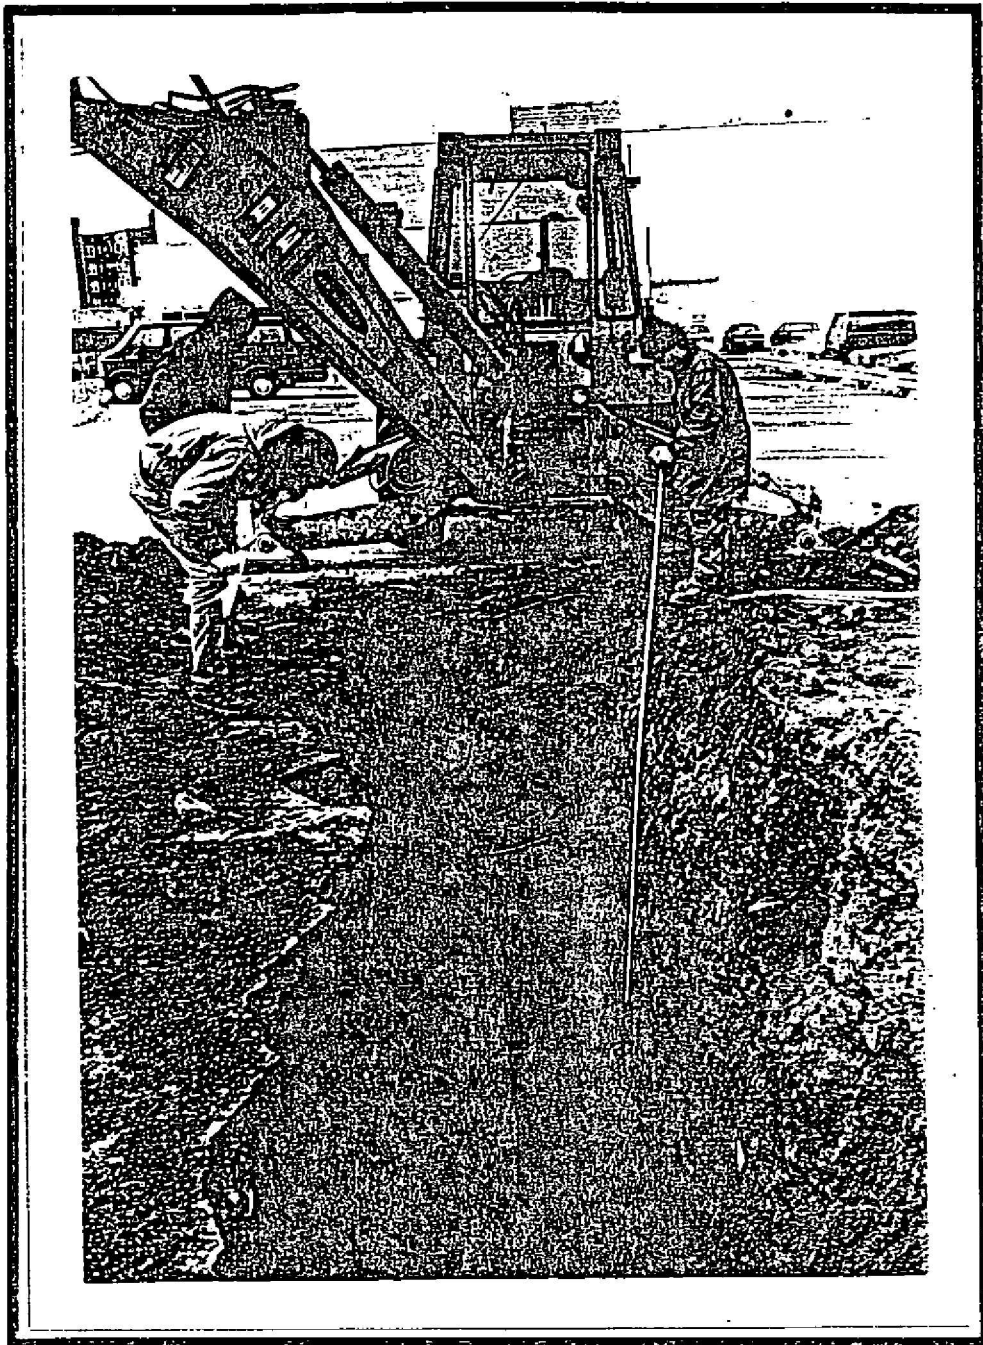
Measuring North Wall Profile, Test Trench 1, Looking West
